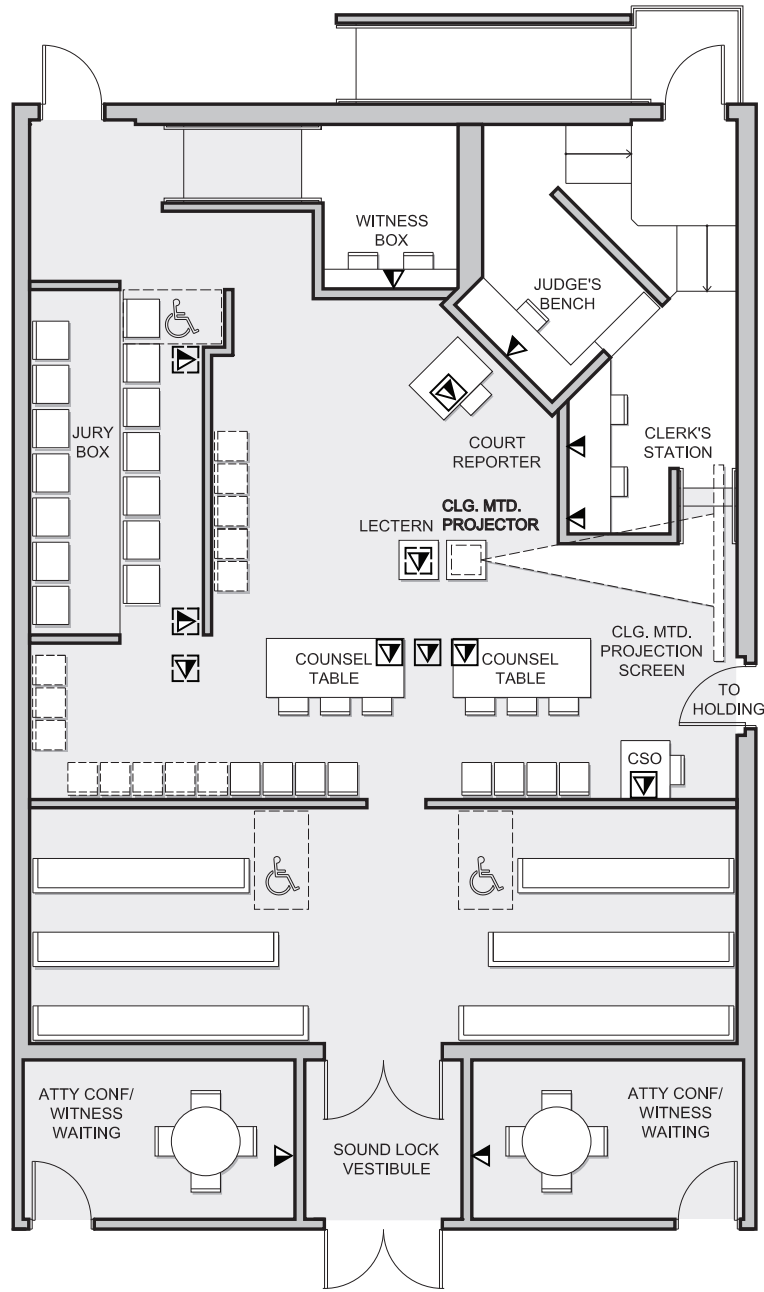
and figure 17.5 identify the typical wall, floor, and future outlet locations within a typical courtroom.
